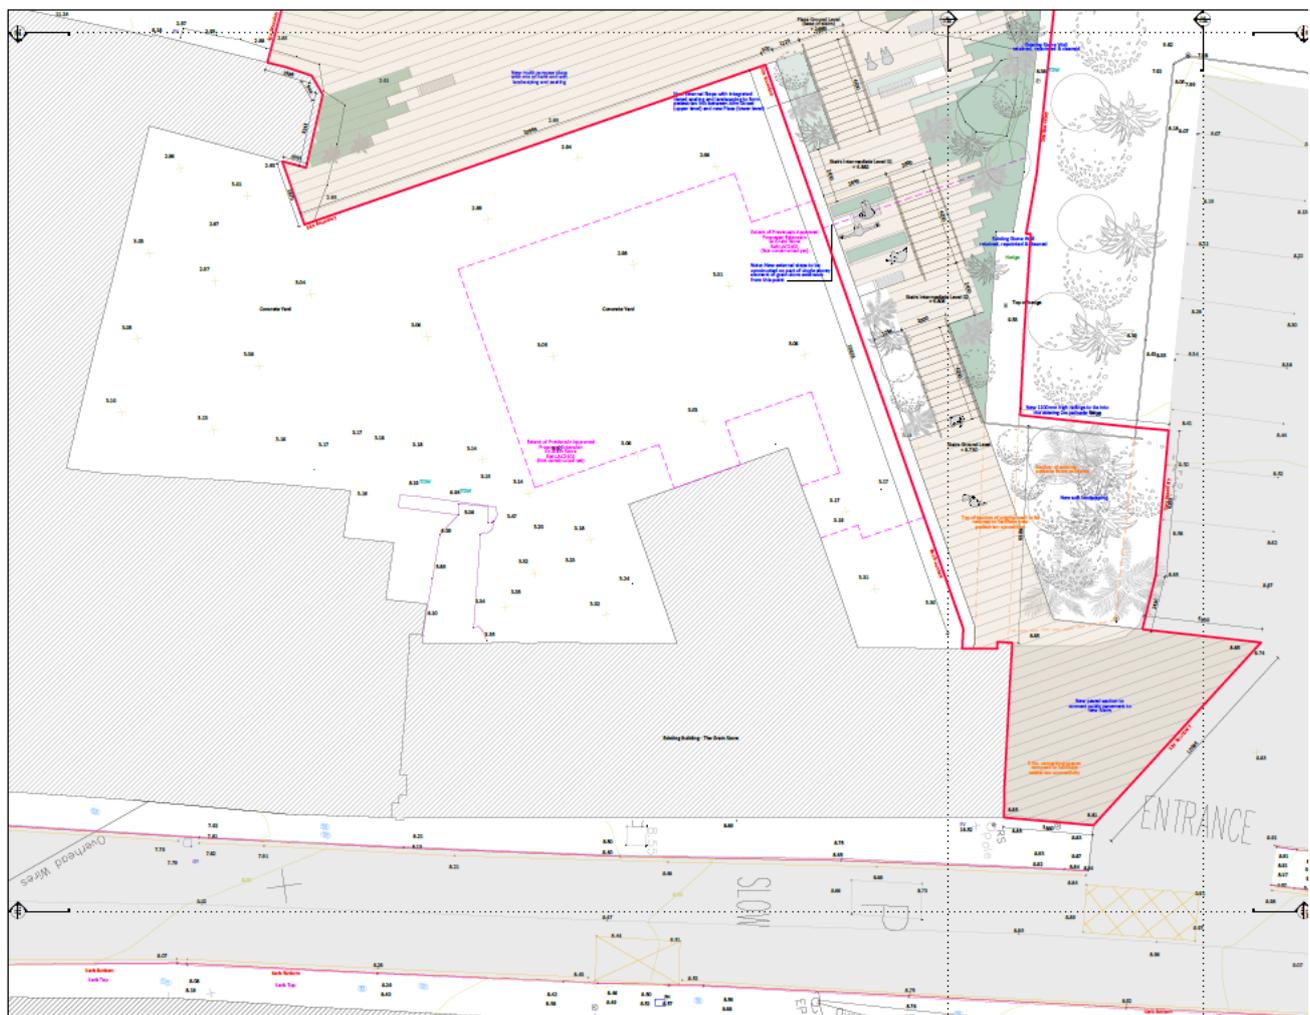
Proposed Site Layout Plan (Source: ODKM Architects)
